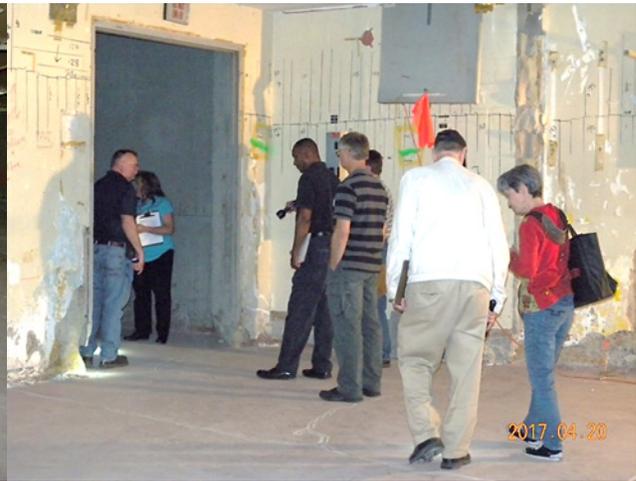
IC Walkdown Participants Observing the Cracks in the Red Concrete in T Building
